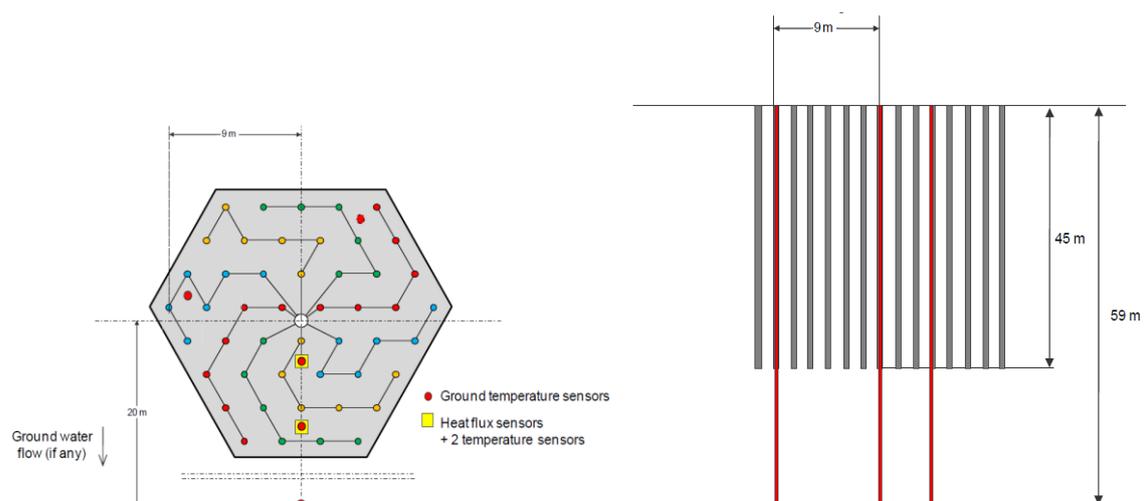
Layout of the BTES in Brødstrup, top view and cross sectional view (Sørensen et. al 2013)
